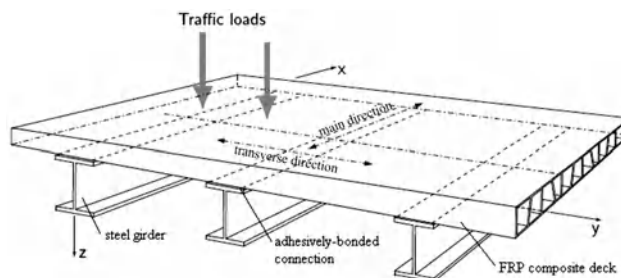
FRP deck to steel girder system (Schollmayer, 2009)
